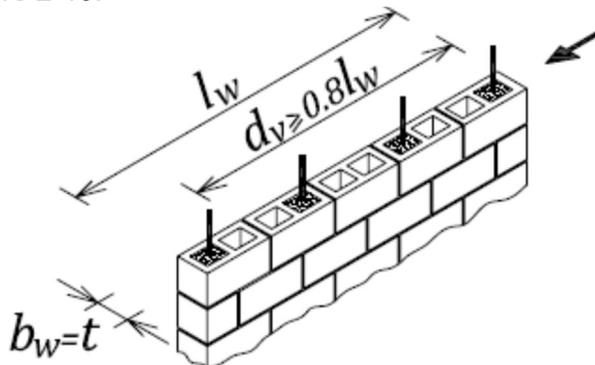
Wall cross-sectional dimensions used for in-plane shear design.
